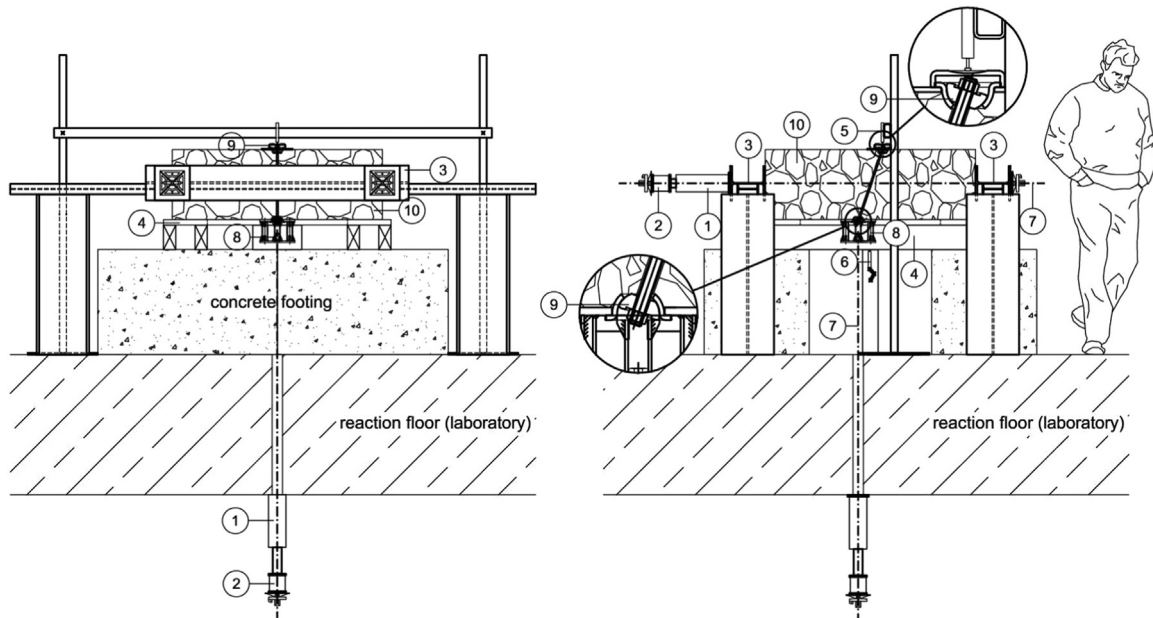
Anchor pull-out tests setup. 1 Hydraulic jack. 2 Load cell. 3 Distribution beam. 4 Wooden substrate. 5 Disp.transducer. 6 Disp. transducer. 7 Diwydag bar. 8 Switch-over piece. 9 Anchoring system. 10 Masonry specimen.
